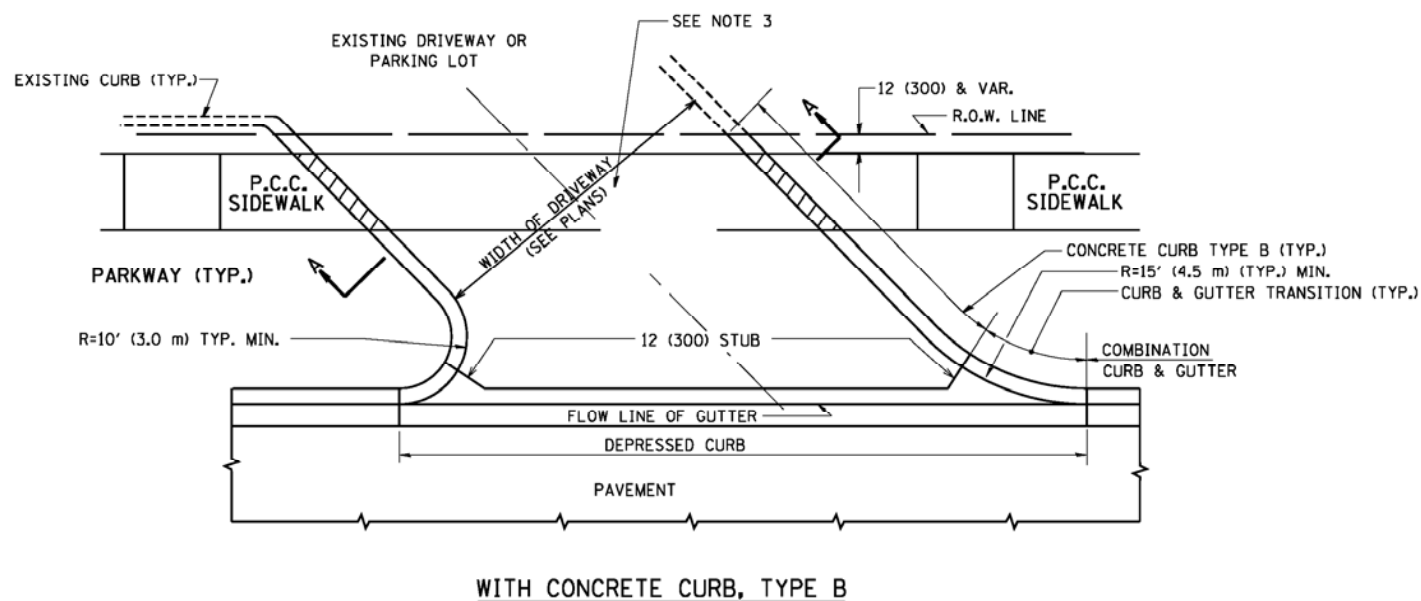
DETAIL FOR CROSSOVERS, DRIVEWAYS, OR PARKING LOTS
